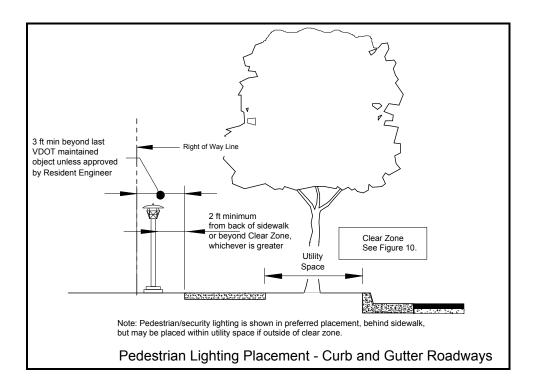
LIGHTING ALONG CURB AND GUTTER SECTIONS
